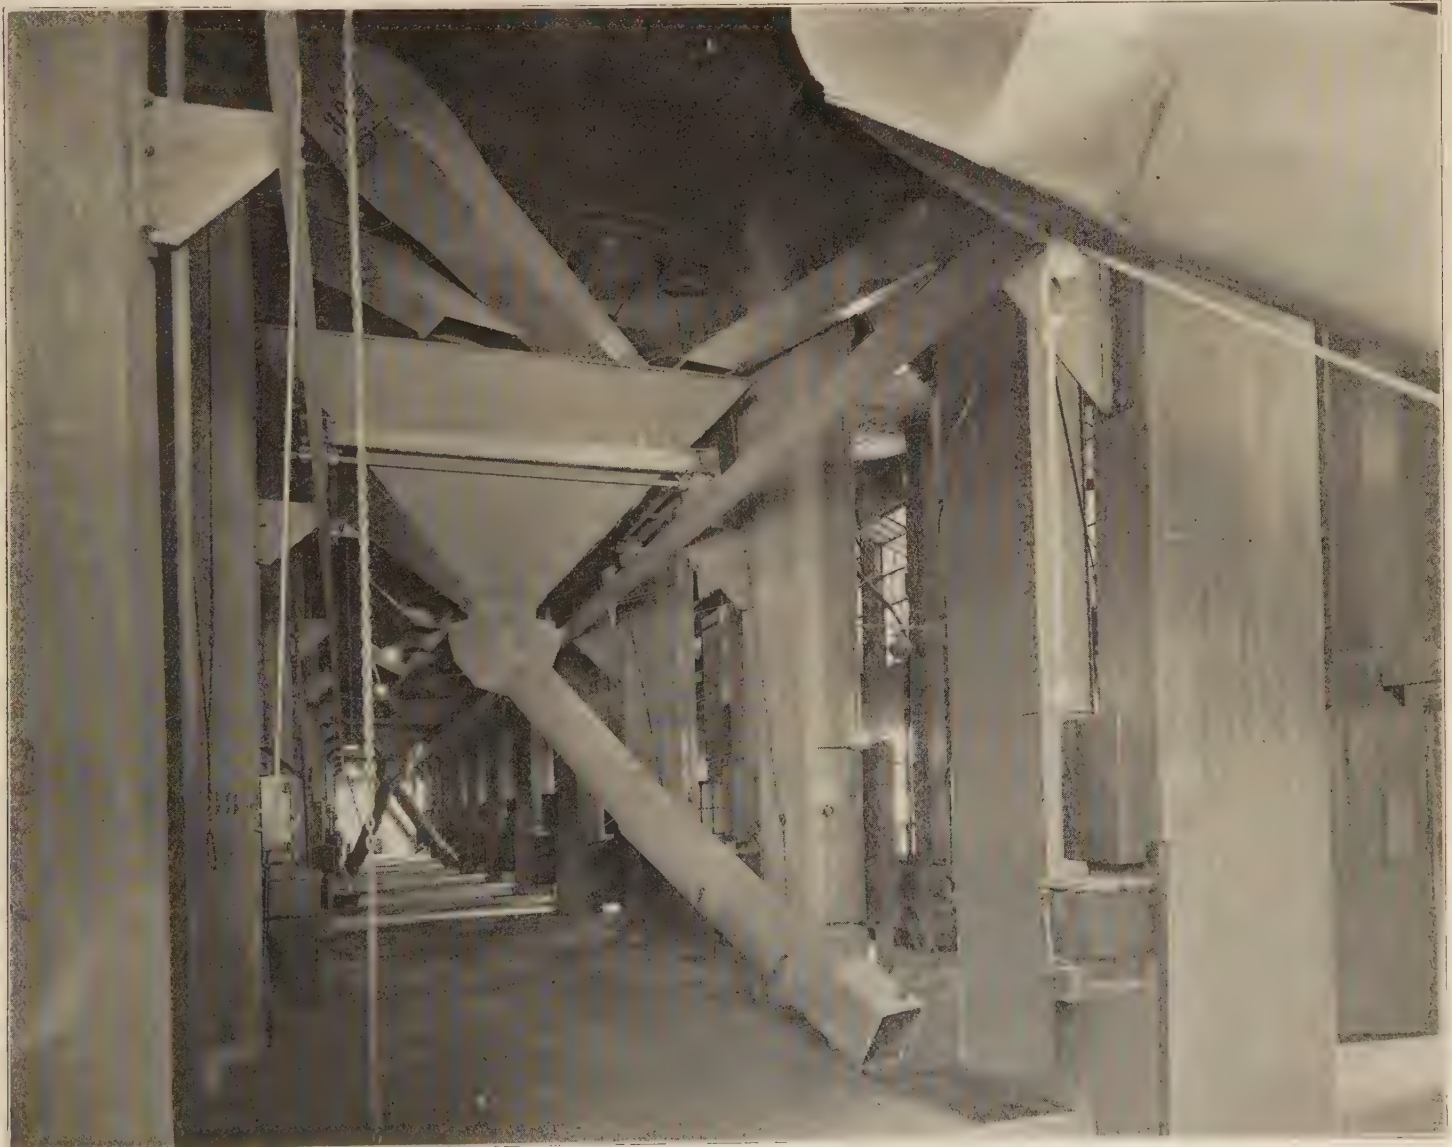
One of the Seven Portable Transfer and Mixing Hoppers on First Floor of Working House Northern Central Elevator, Baltimore.
